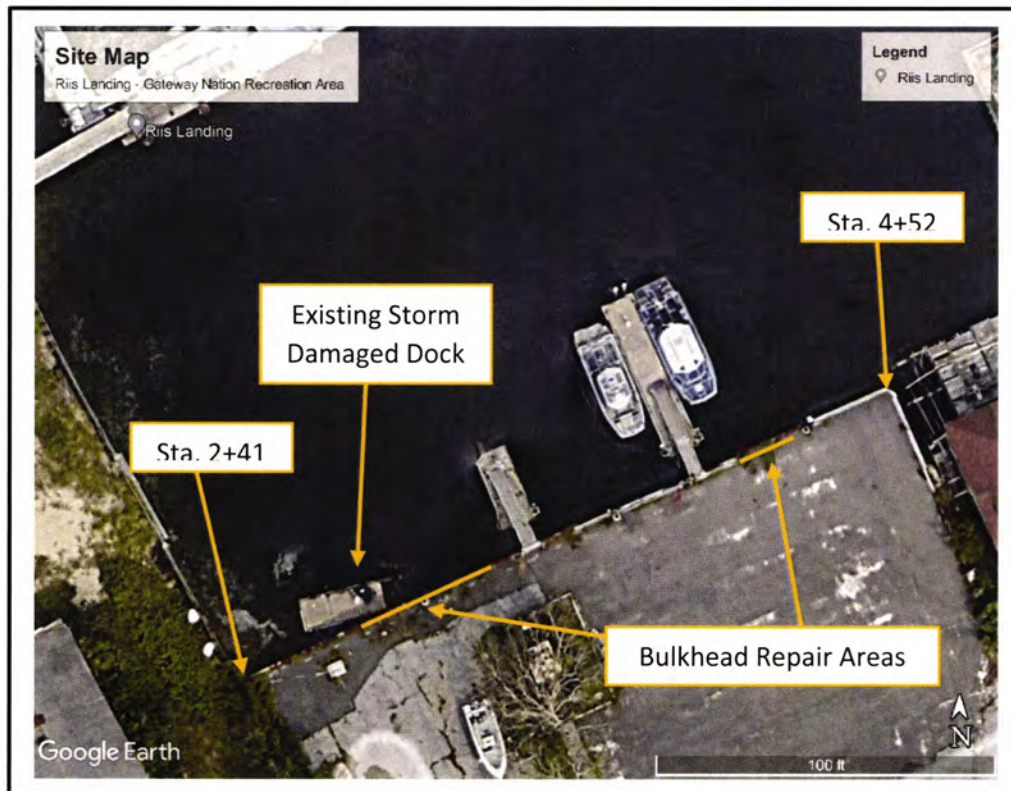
View of project site – Dock replacement and bulkhead repairs.
